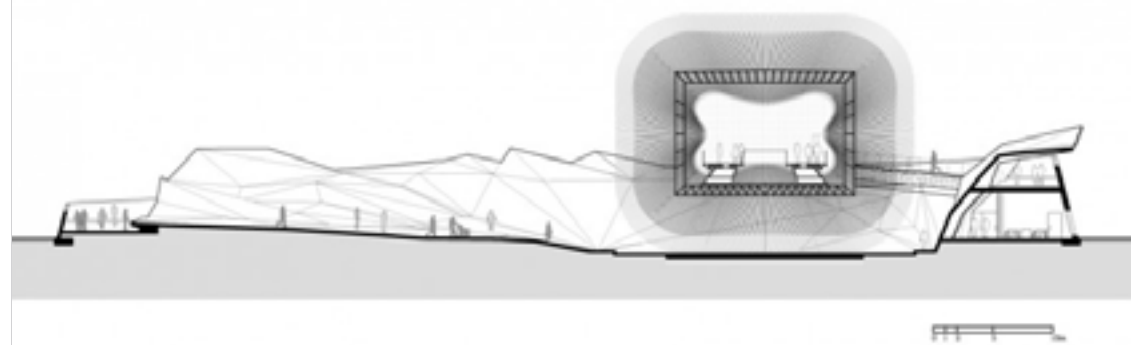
[top] UK Pavilion for Expo 2010 Shanghai – site section
